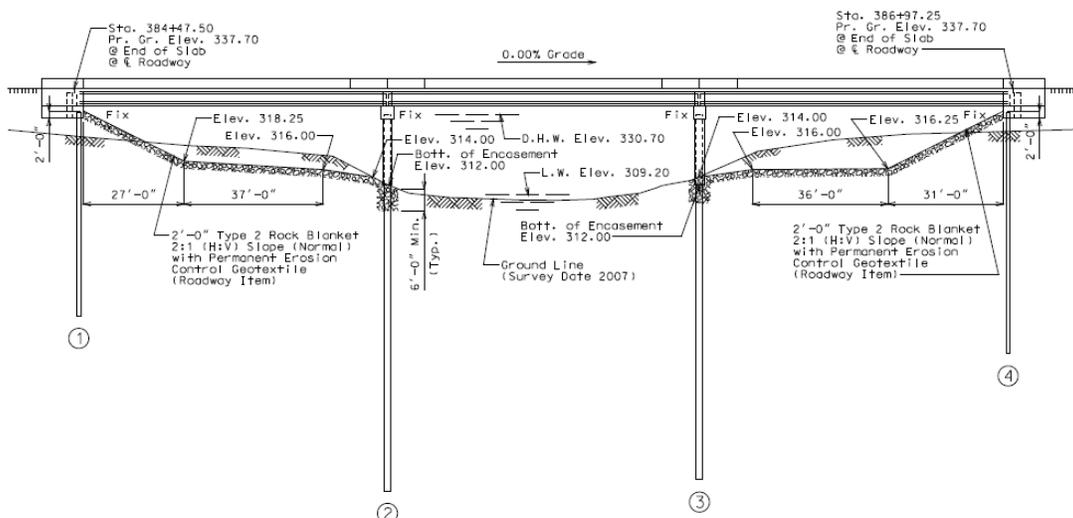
MoDOT Illustration of A7669 Proposed Structure (MoDOT, 2013)
